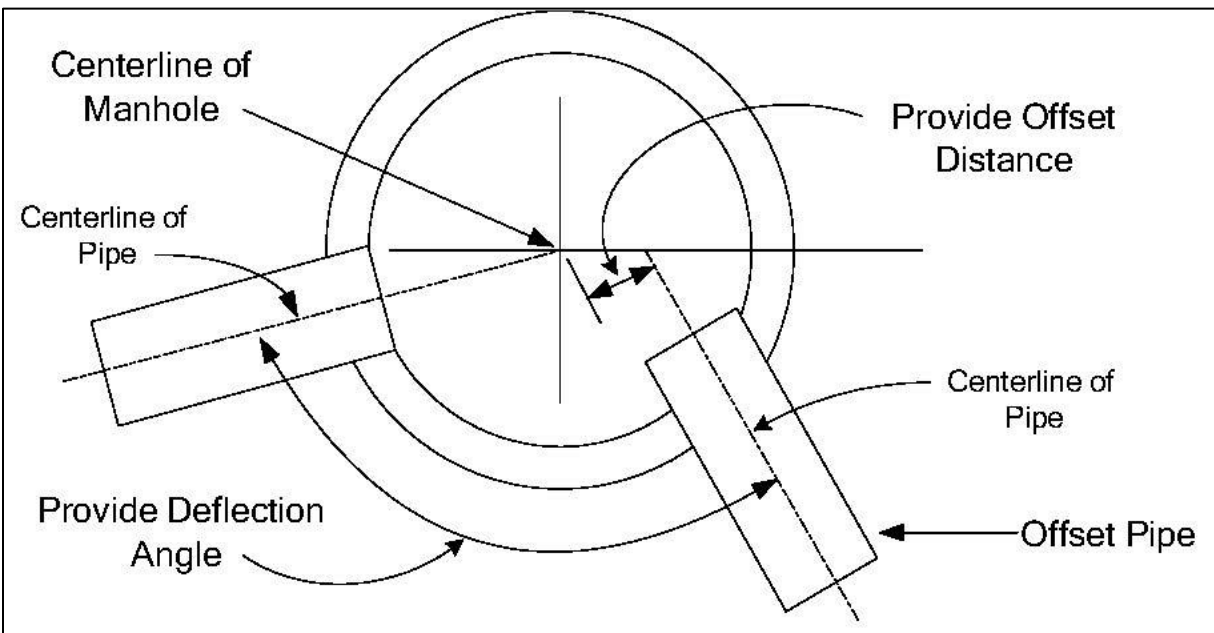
Offset Pipe Connections to a Manhole⁴⁵
